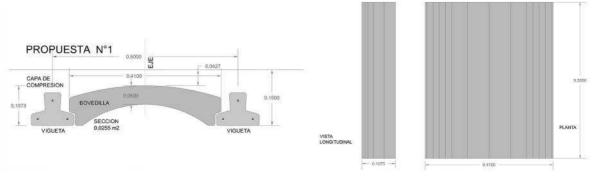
"Plant, longitudinal view and section of the proposal Nº1"
